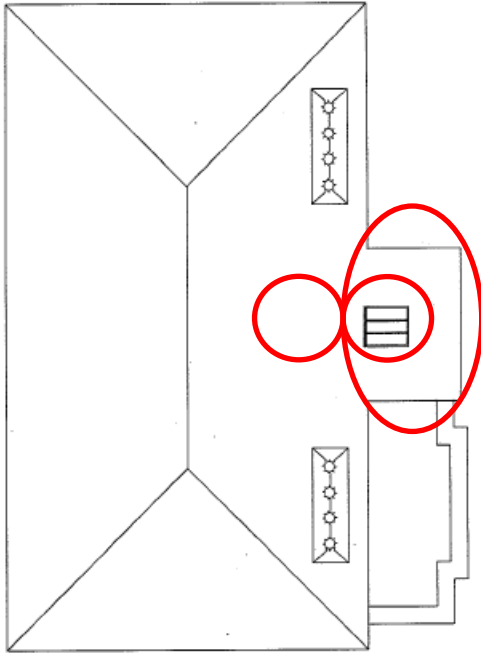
Drawing Upper Floors (30 September 2008) showing current state of roof, showing significant extension of slate roof, filling in of old skylight and new skylight.
